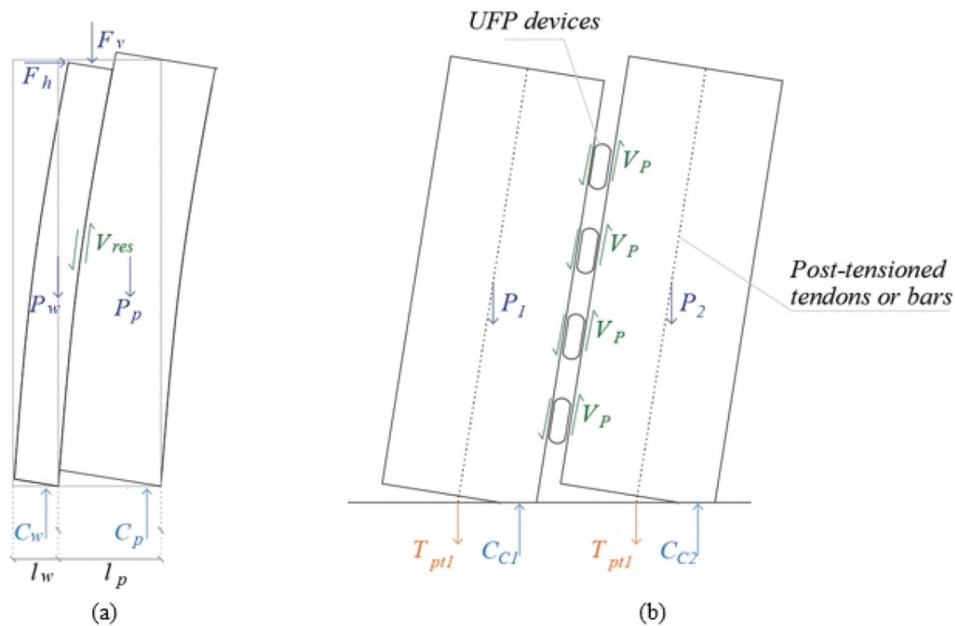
Equilibrium of the coupled pier-wall (a) and an example of a coupled post-tensioned rocking wall via U-shaped flexural plates (NZCS 2010).
